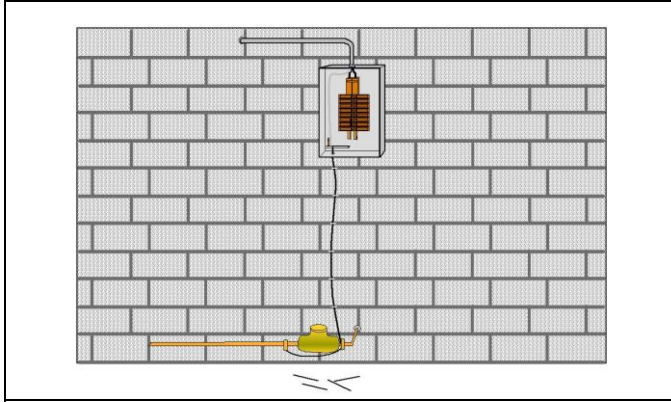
A poorly installed aluminum ground wire failed due to corrosion at support staples driven into the masonry.
